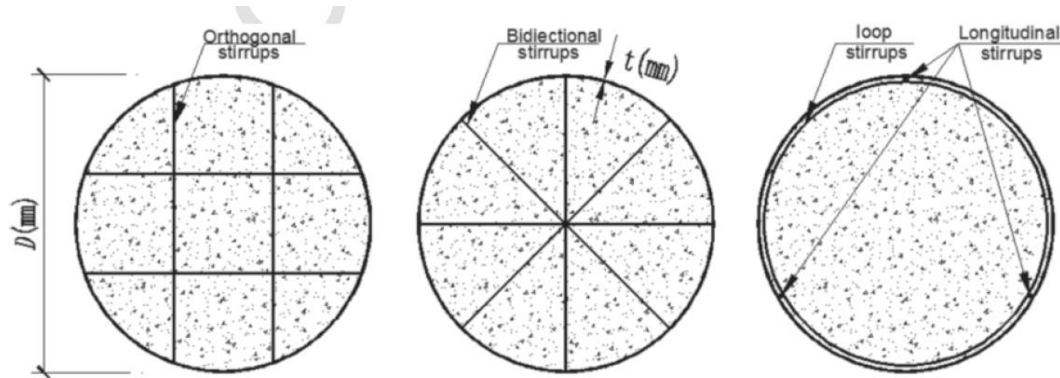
Cross Sections of Tested Columns, Ziang Zhu et. al. [2017]
